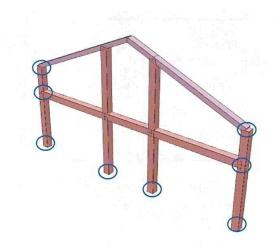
Structural assessment model of the end wall, with restraint points circled
